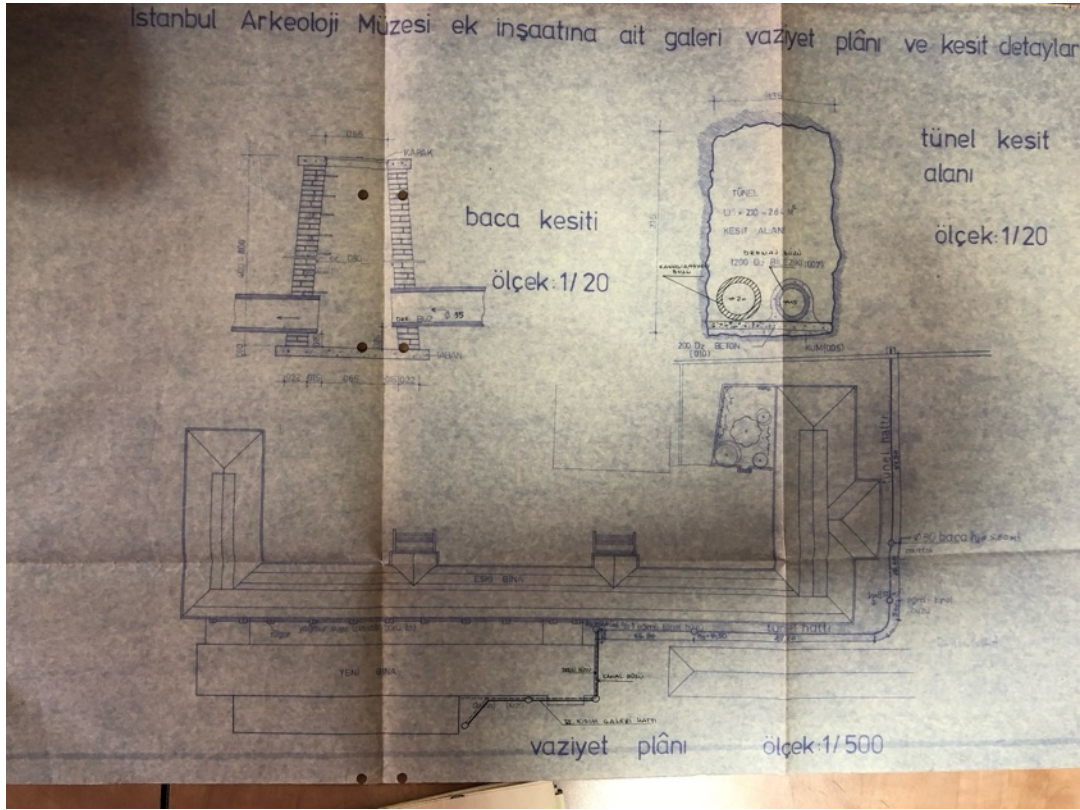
Drainage plan of the additional construction for the Istanbul Archaeology Museums (source IDSMA Archive)
